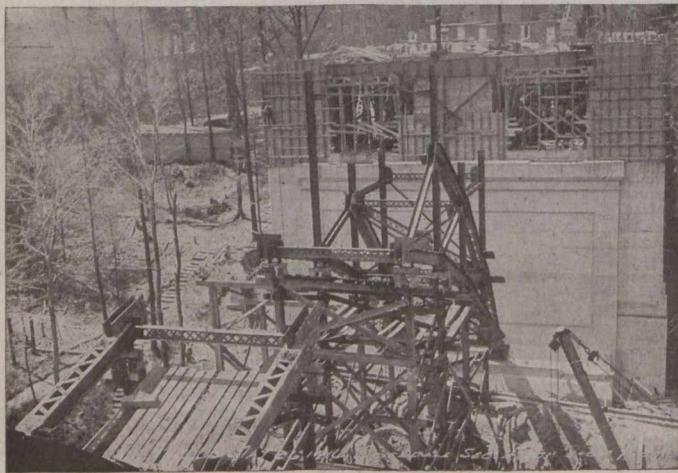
Rosedale Section, View of Arch Under Construction. Photo Taken from Pier H.
